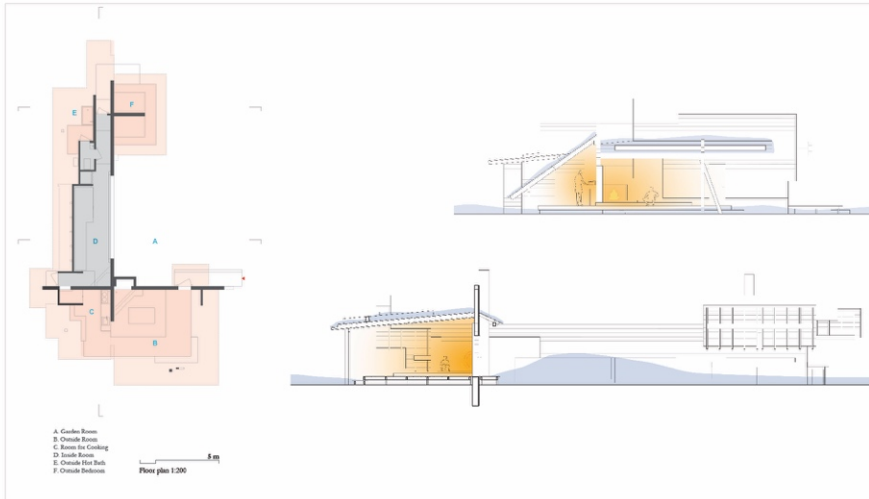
Plan drawing and sections of the Inverted House produced by the AHO team in 2015.
